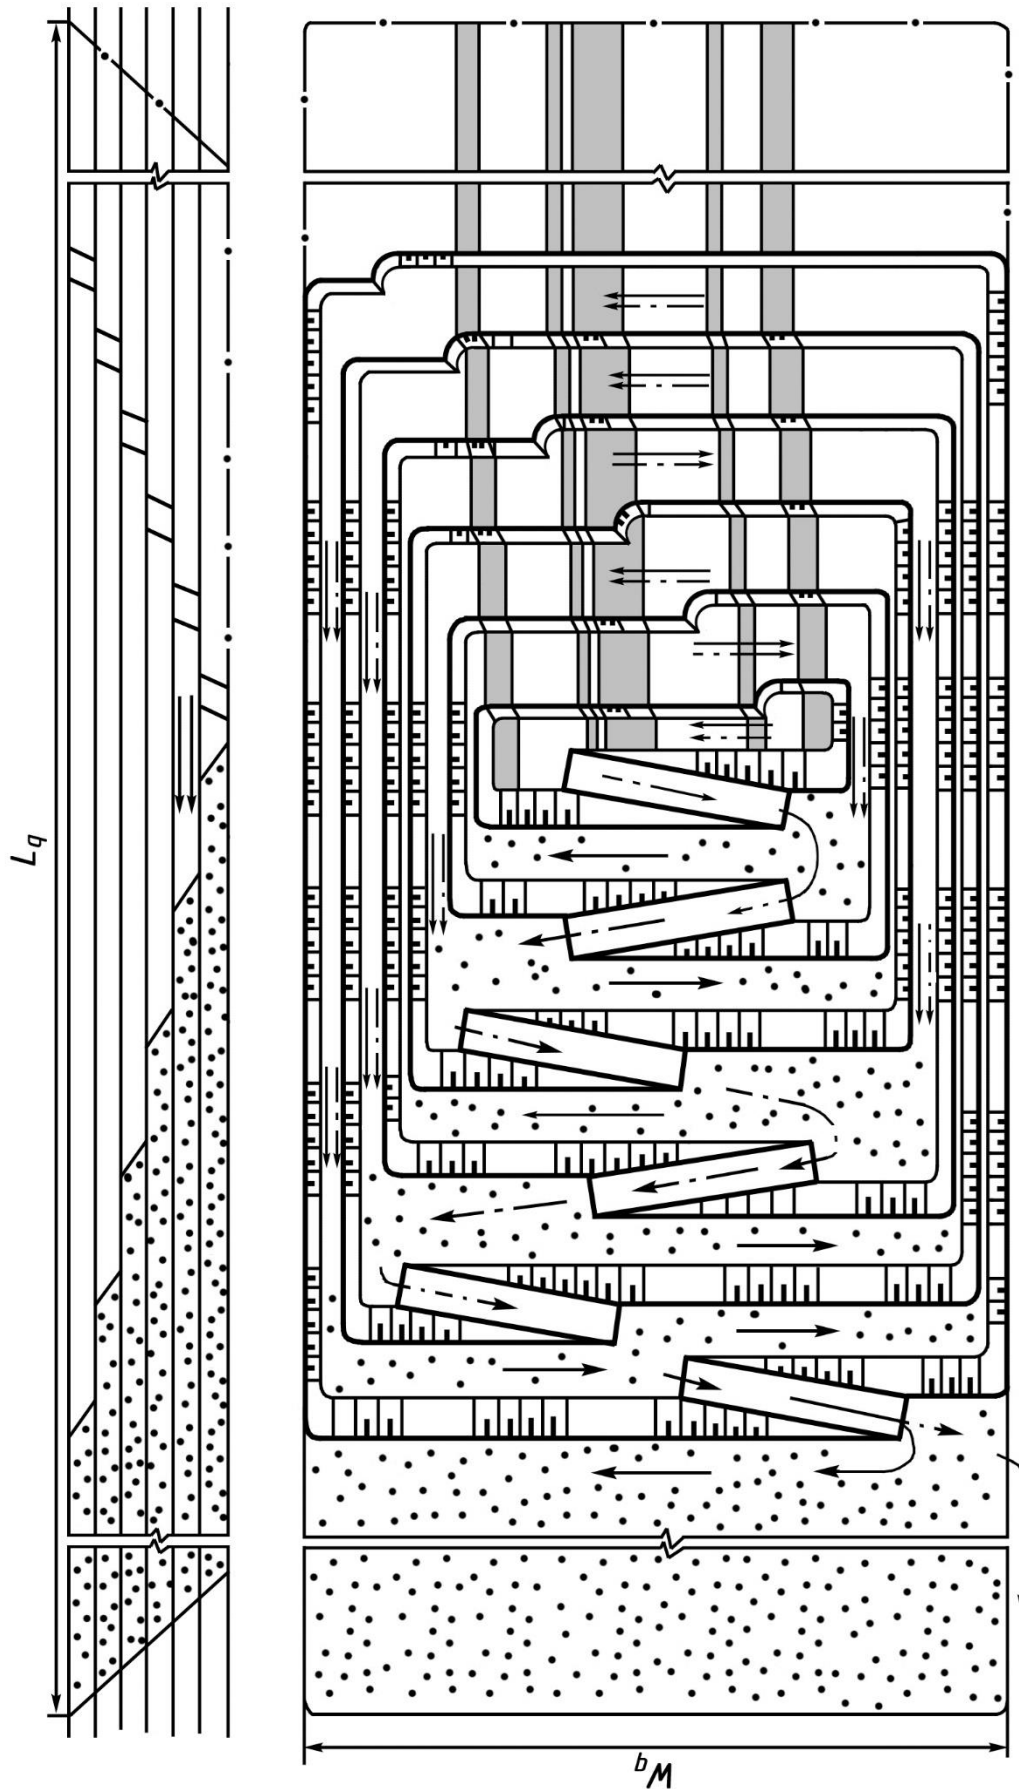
Opening by trenches located on dump tiers at transverse mining system
